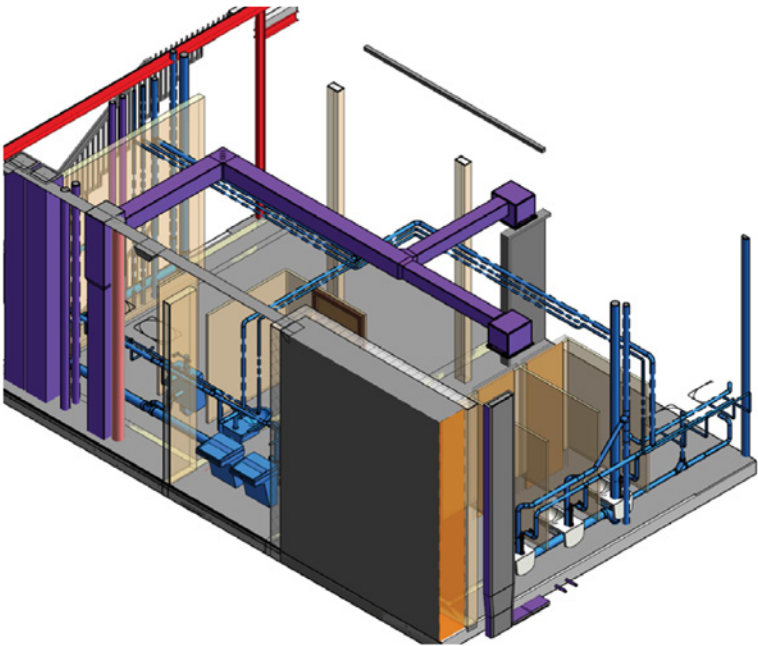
Proposed Plumbing Riser - 3D
